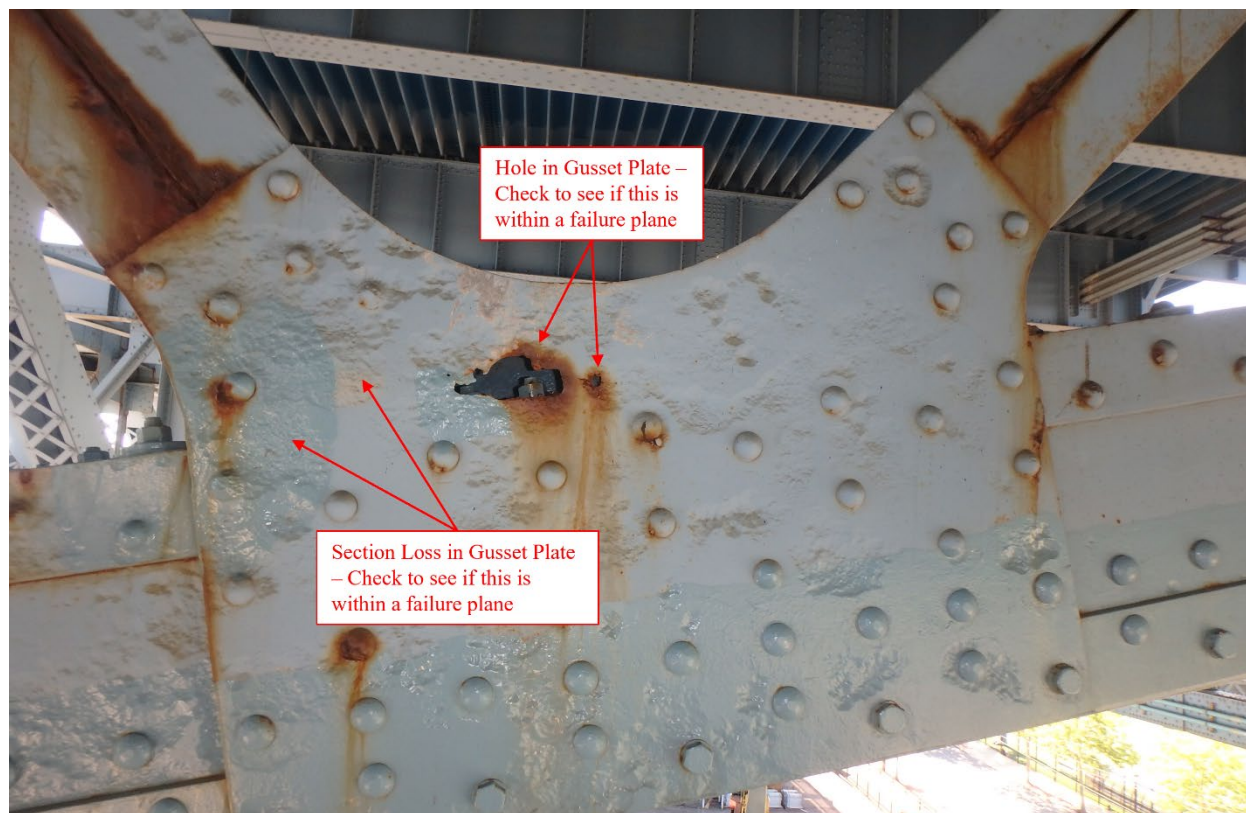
Example of Section Loss in Gusset Plate
